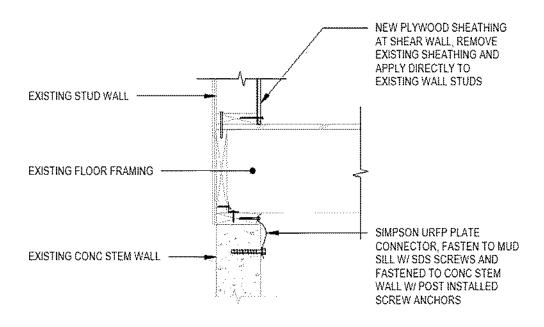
Connection at Shear Wall to Conc Stem Wall
